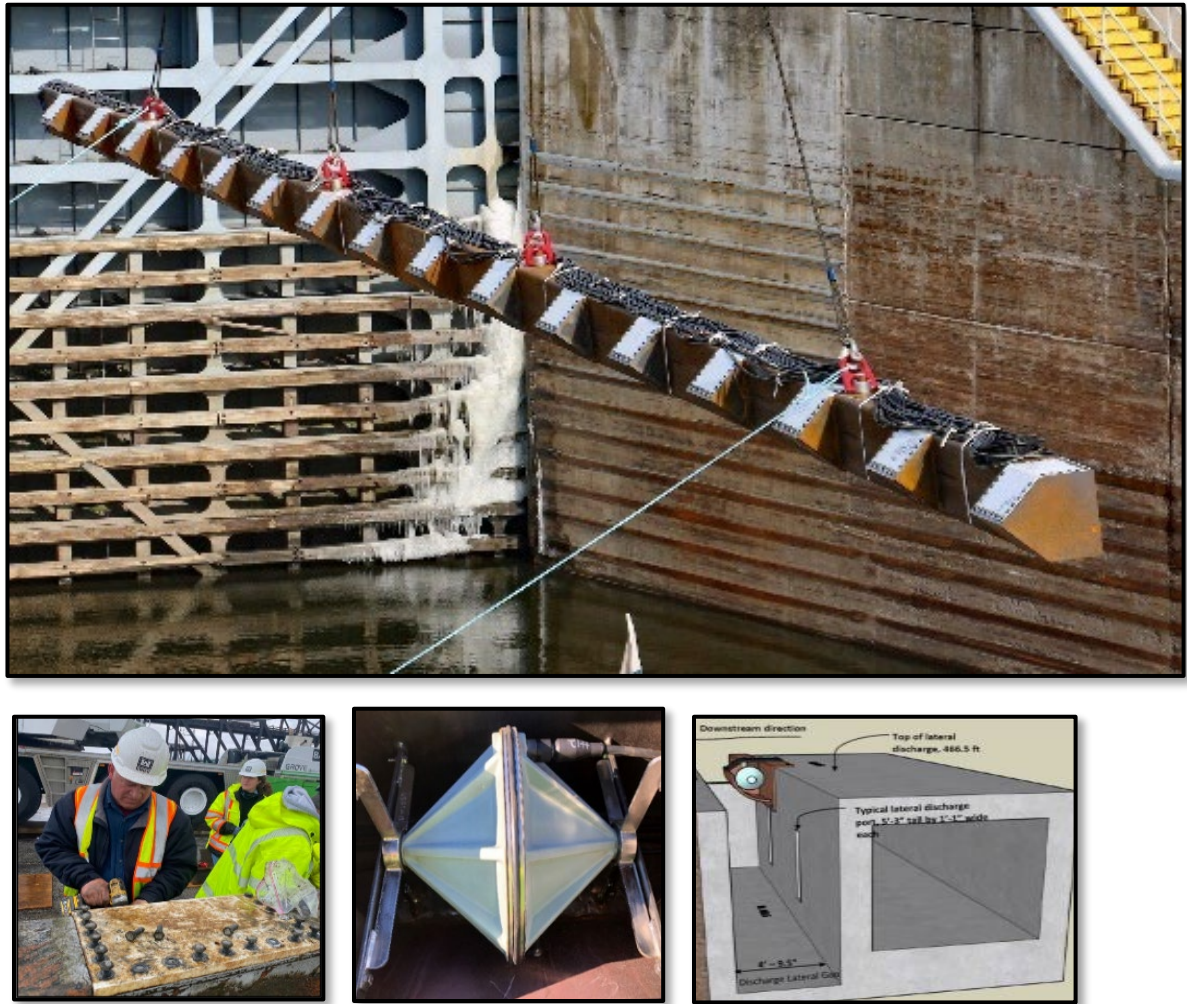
Weldment (aka “Soundbar”) during Deployment at Lock No. 19.
